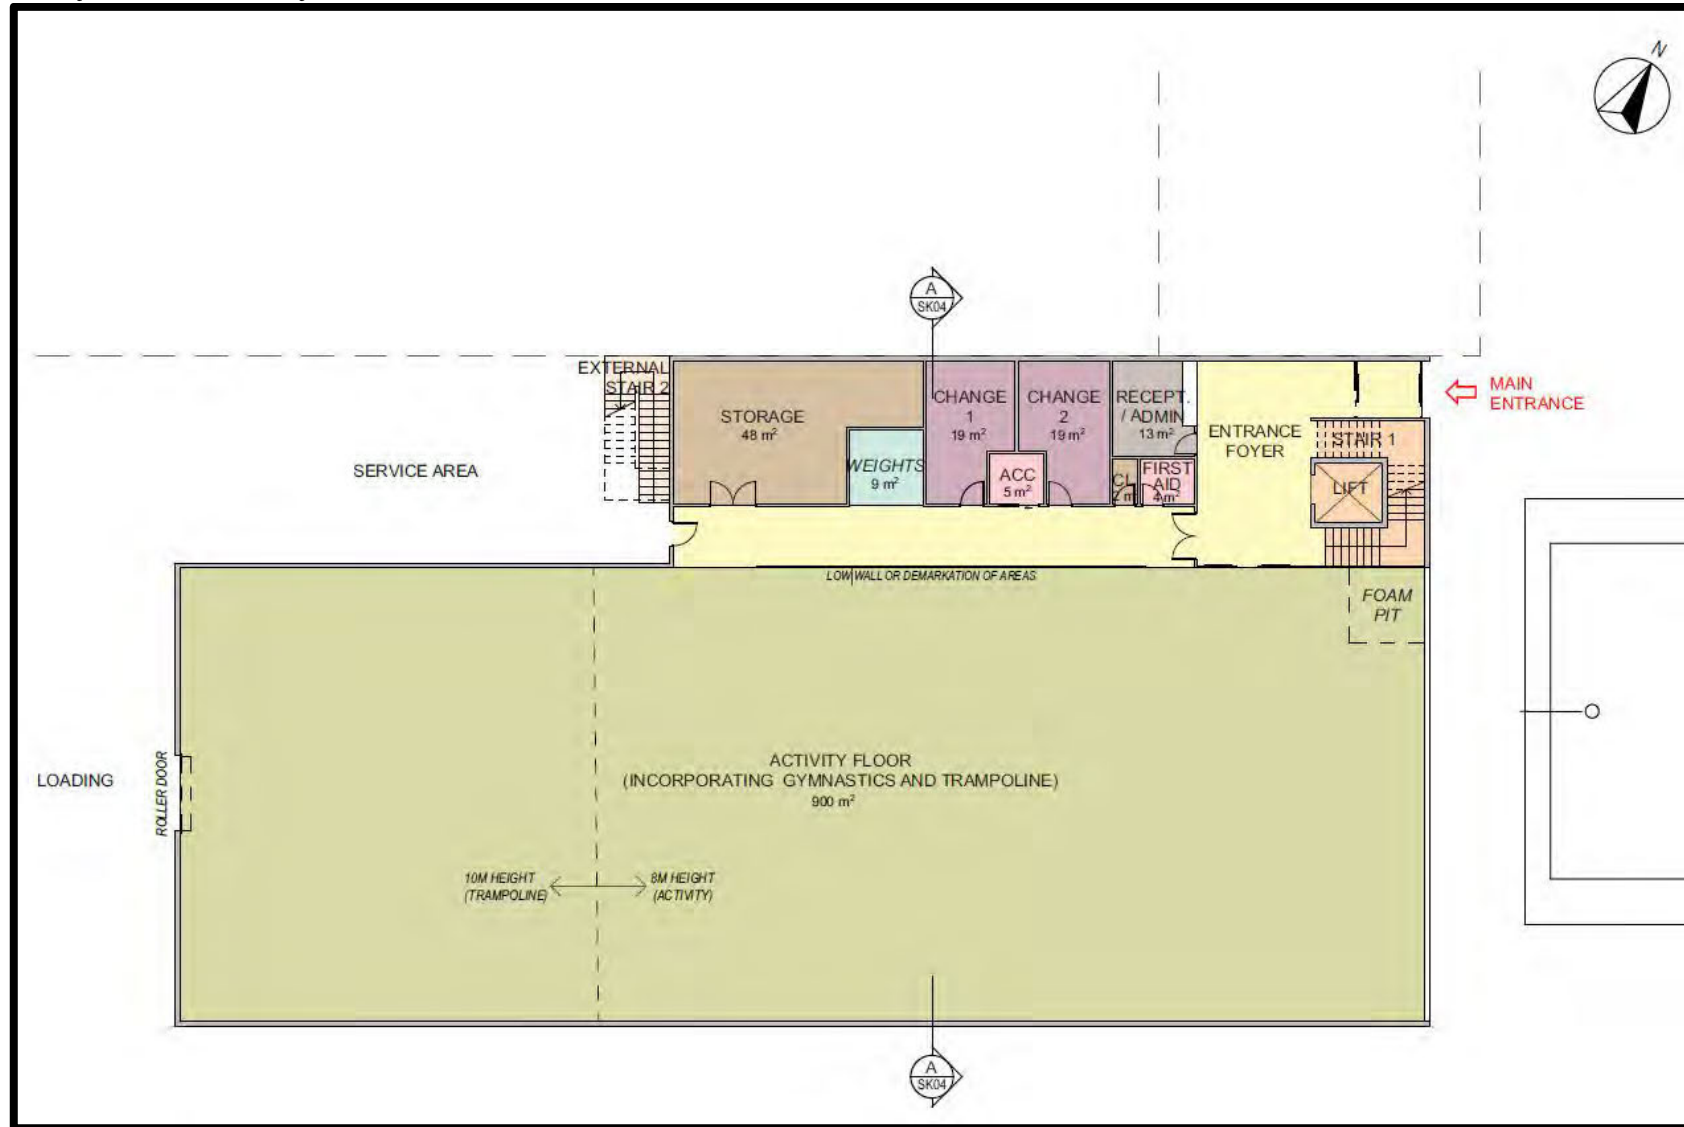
Wanaka Gymnastics Facility - Indicative First Floor Plan
